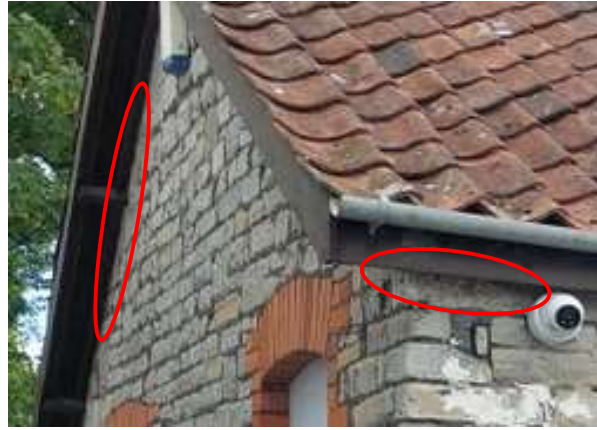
and 71 Gaps under roof, hip and ridge tiles of The Barn roof
